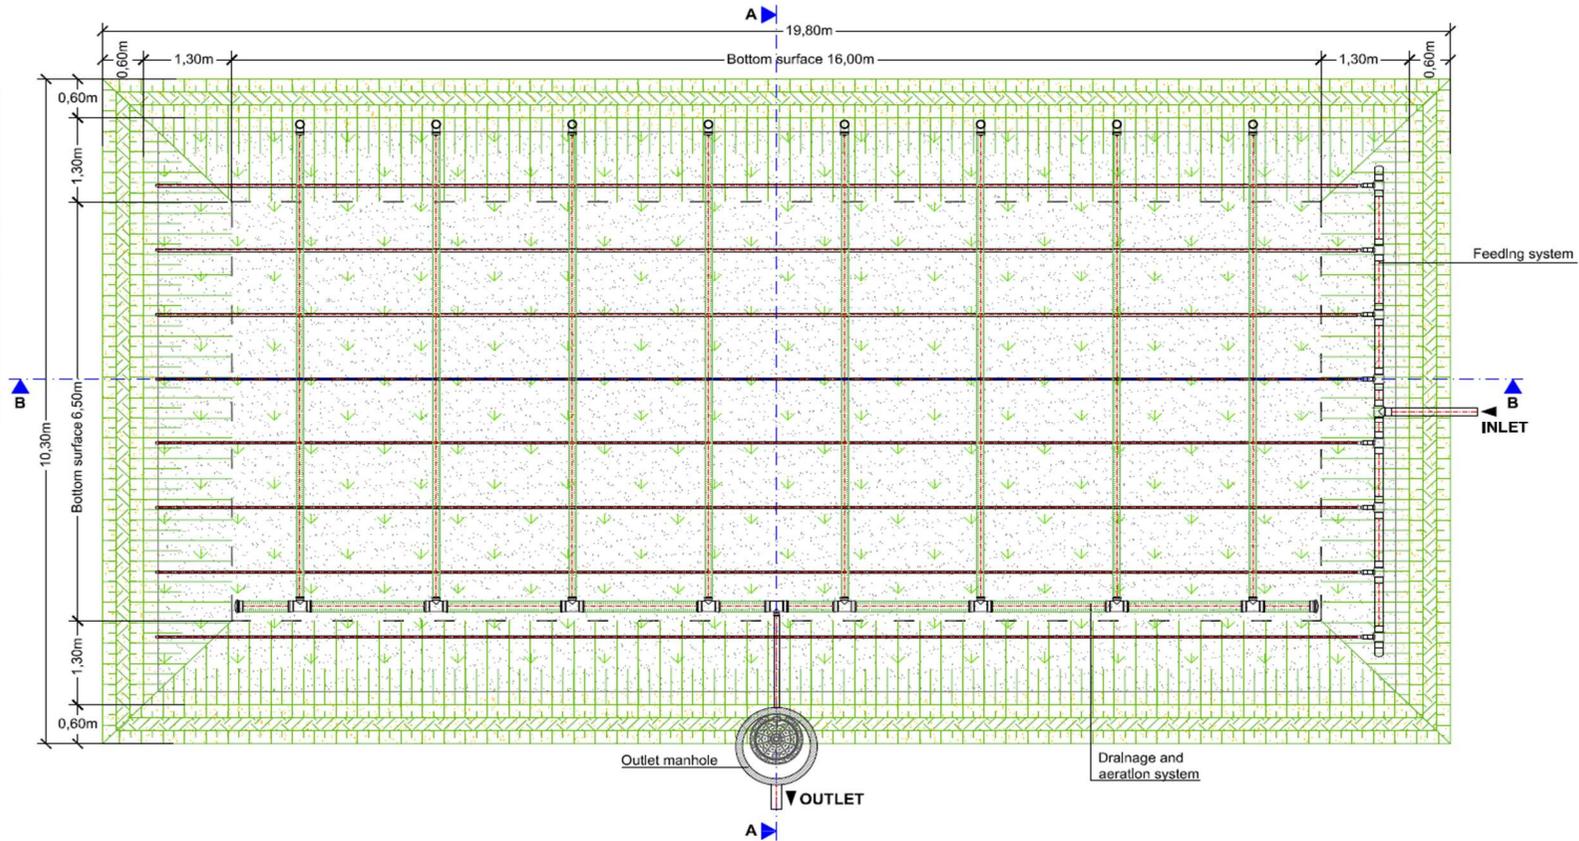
Planimetry of VF2 UNSAT – Line A
